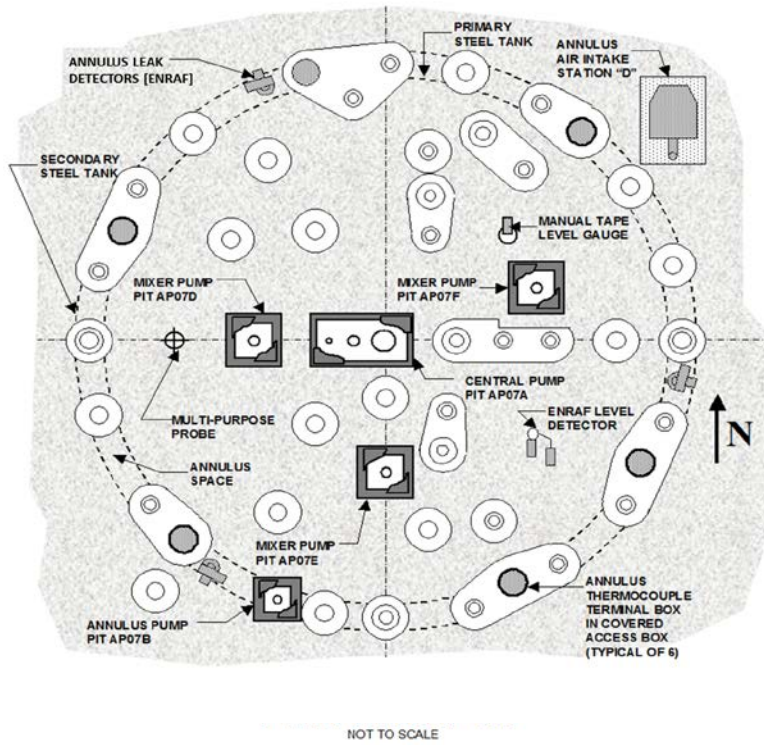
Tank 241-AP-106 Grade Level Plan View
